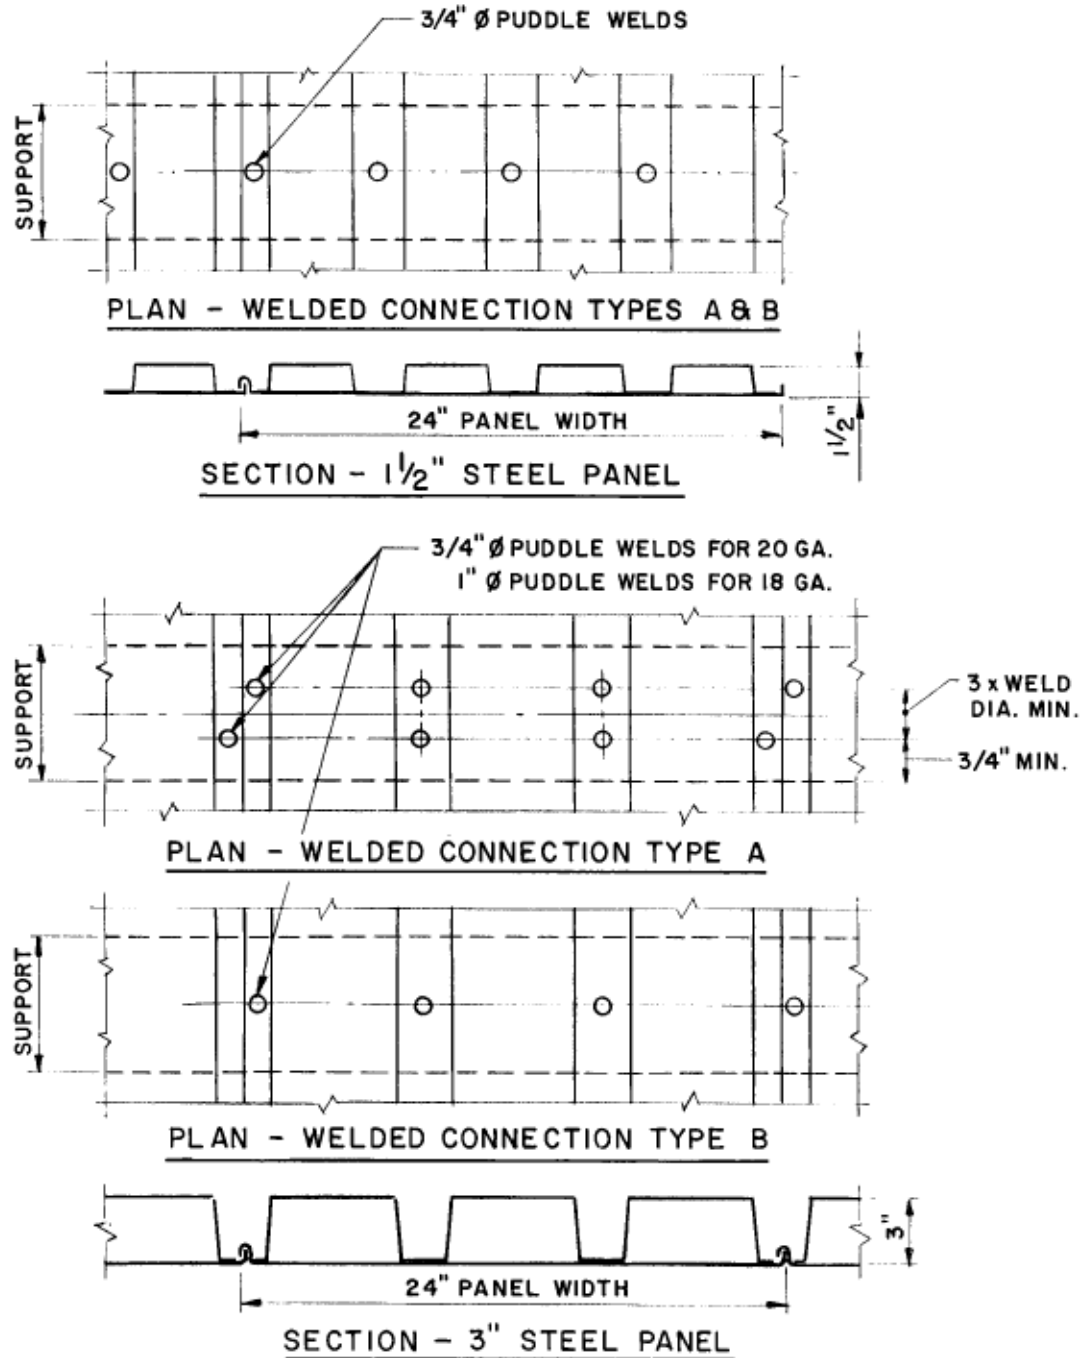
Typical Details for Cold-Formed, Light Gage Steel Paneling
